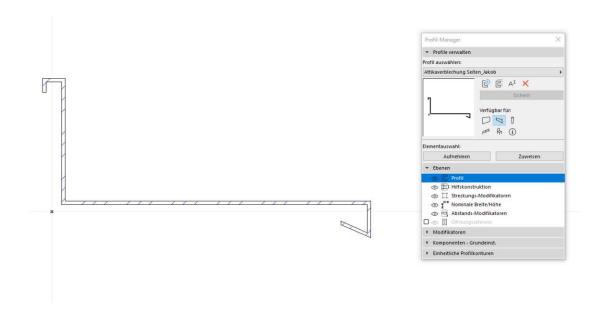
Test2 - the parts must be drawn separately to be identified easier late in the process
